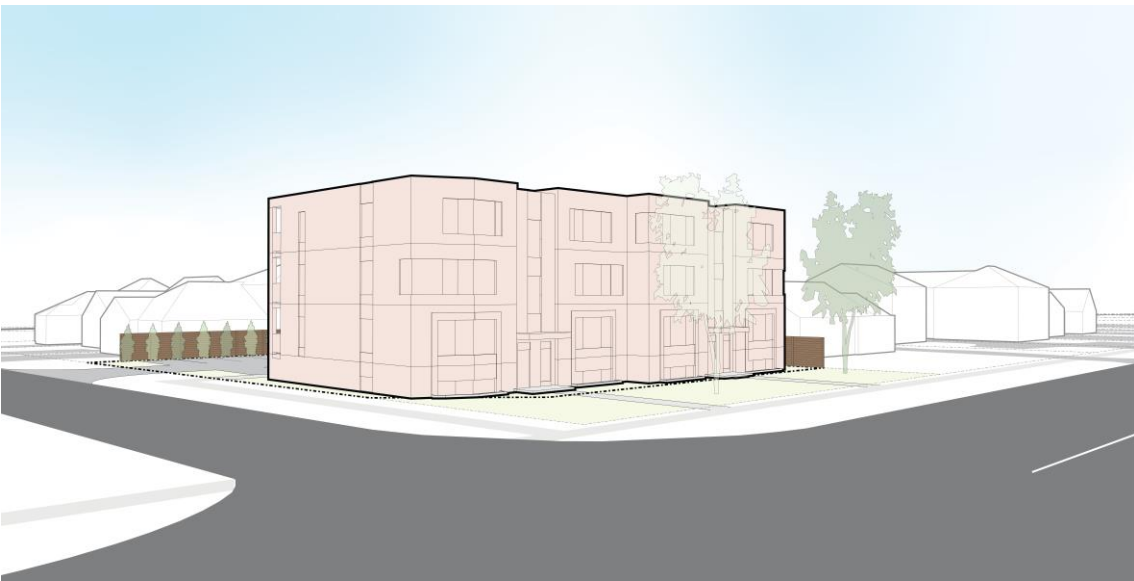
Rendering of proposed building – view from Southdale Rd E
